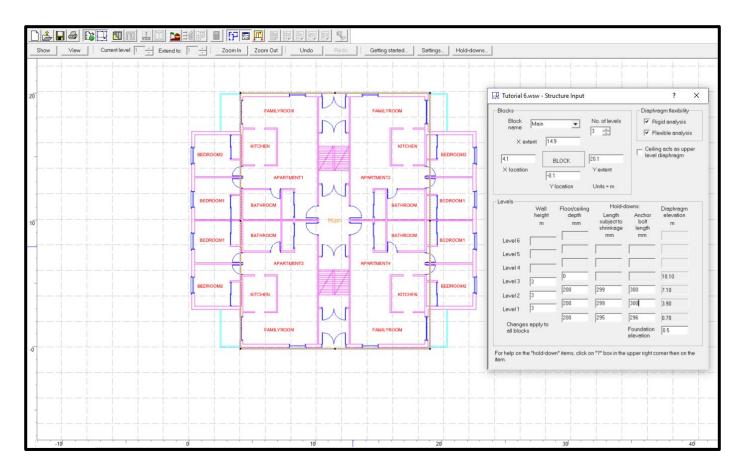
Shearwalls Tutorial 6 – CAD Drawing Block
